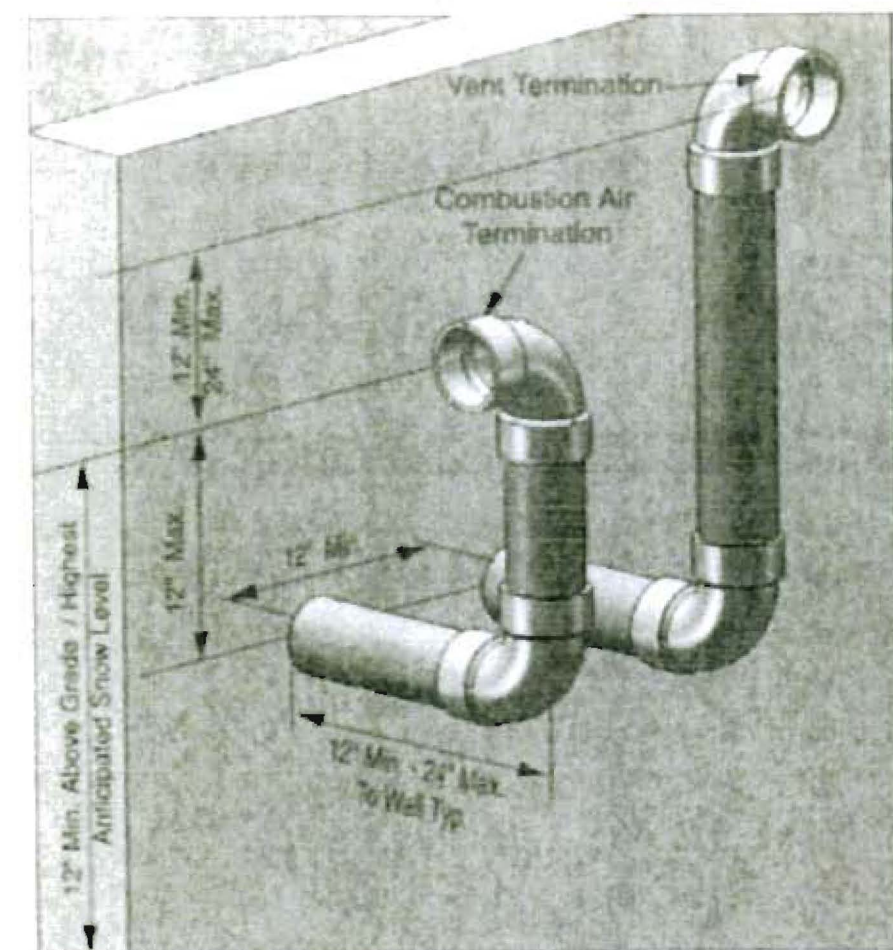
Direct Vent - Sidewall Snorkel Termination of Vent and Combustion Air Piping
